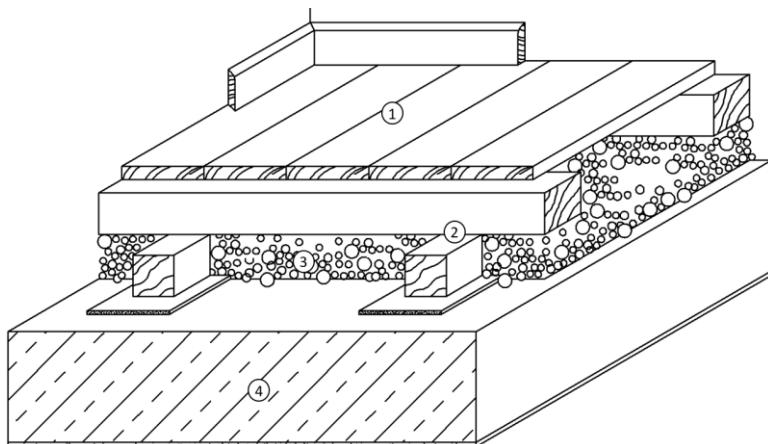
Layered structure of variants 3, 4 and 5 – concrete
